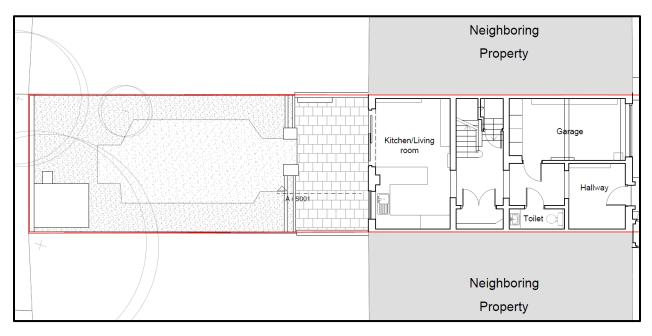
Existing Ground Floor Plan - 3a Priory Terrace
